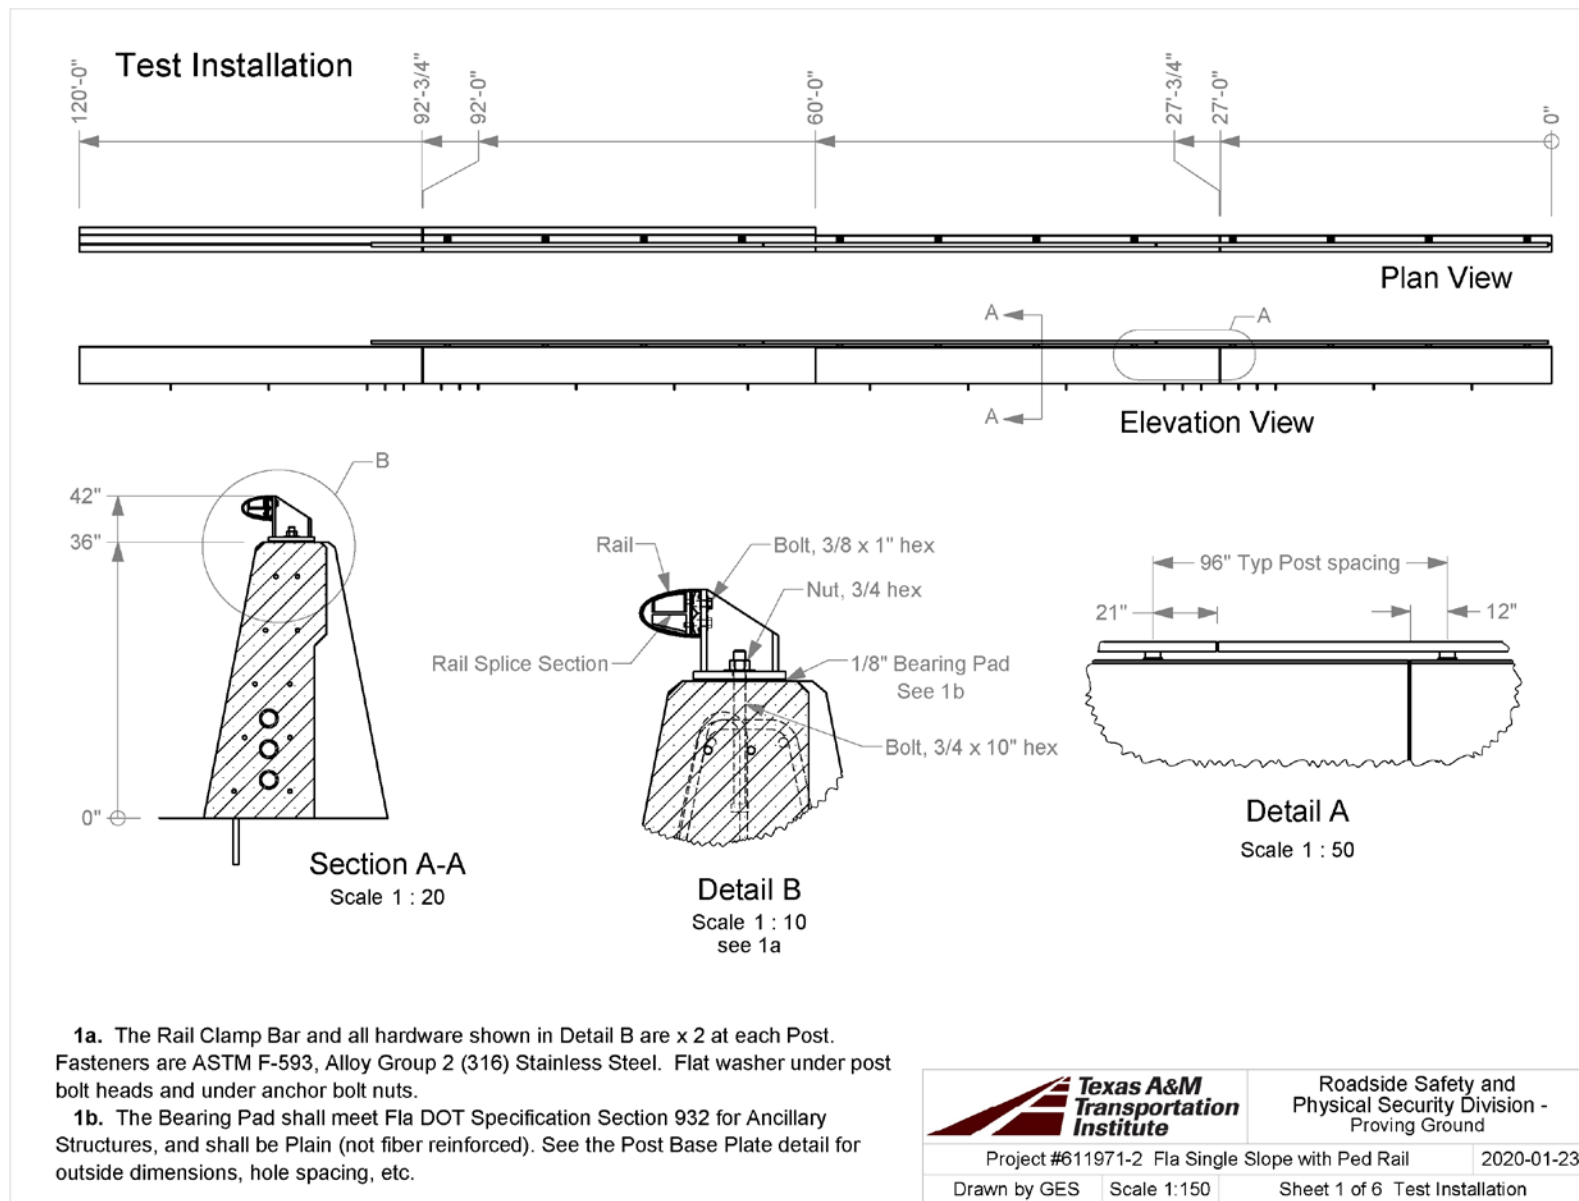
Details of 42-inch Tall Combination Traffic-Pedestrian-Bicycle Bridge Rail System.
